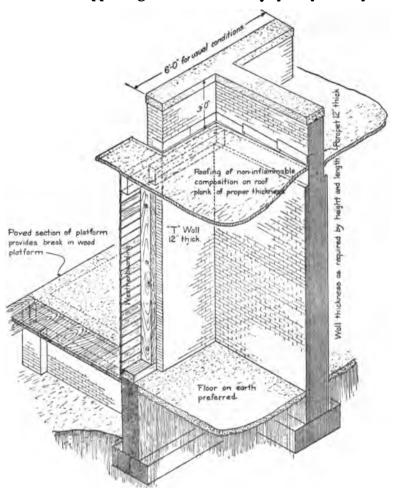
Method of forming fire stop by division fire wall without obstruction to platforms.
